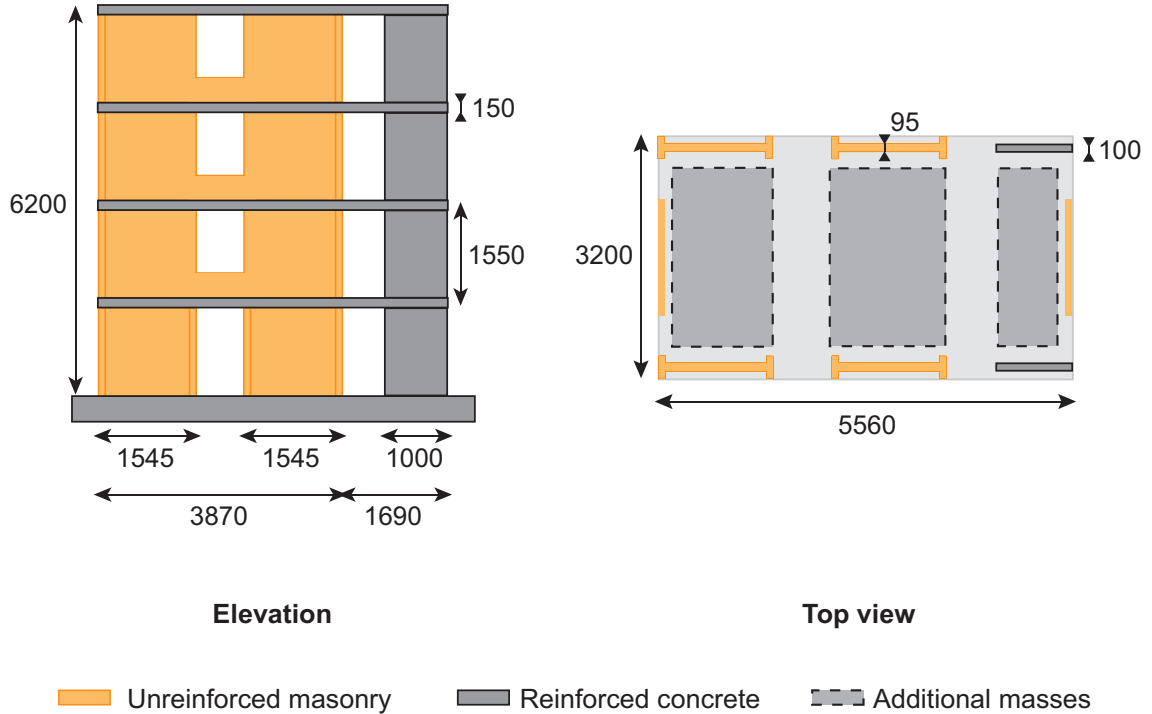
Schematic drawings of the mixed unreinforced-masonry reinforced-concrete building tested on a shake table by [65]. Dimensions correspond to a half-scale specimen. Additional masses have been added to comply with similarity laws for stresses. Shake-table tests have been uni-directional in the longitudinal direction.
